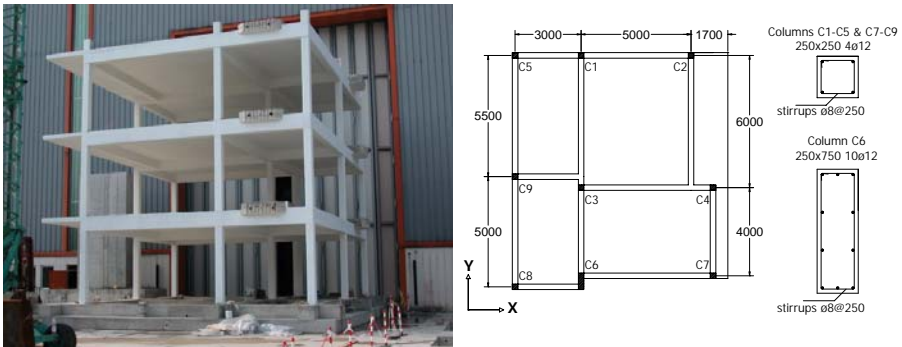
Photo of the test structure outside the lab (left) and plan of the framing (right).
